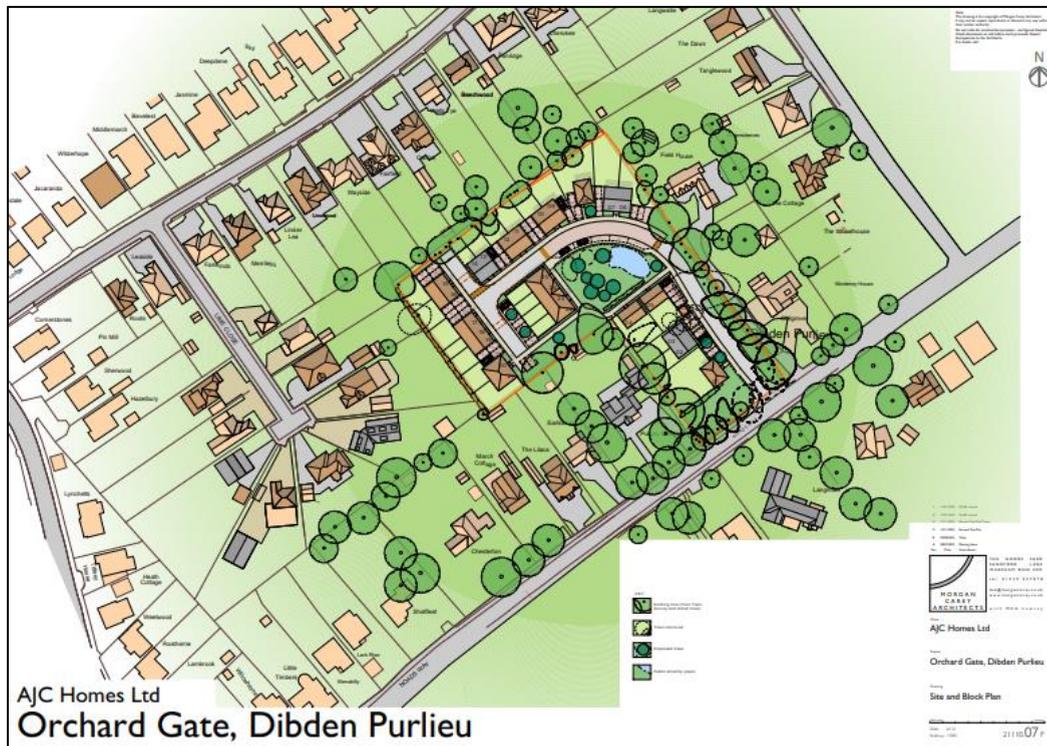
Pre app submission plan (plan courtesy of Morgan Carey Architects)
